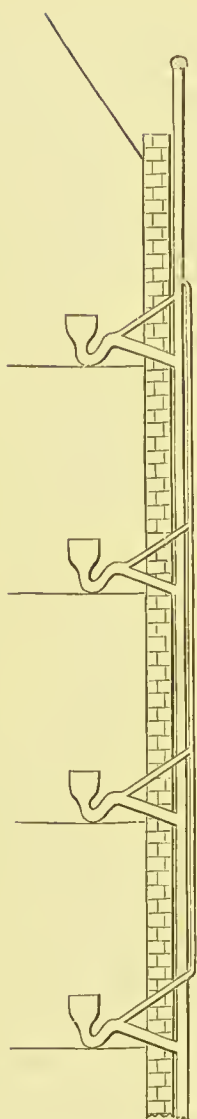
SOIL PIPE AND VENTILATOR, WITH ANTI-SIPHONAGE PIPES FROM THE WATER-CLOSET BRANCHES.
